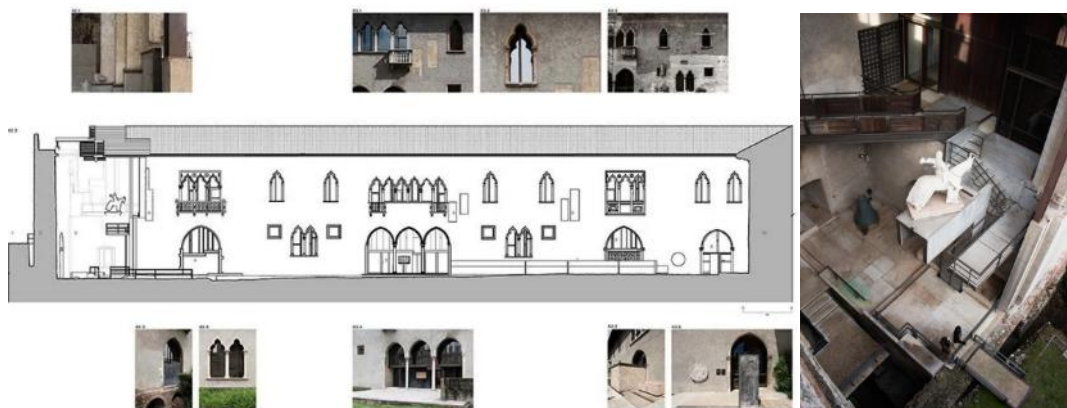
Building façade and atrium design (Pictures from *Archdaily.com*)
